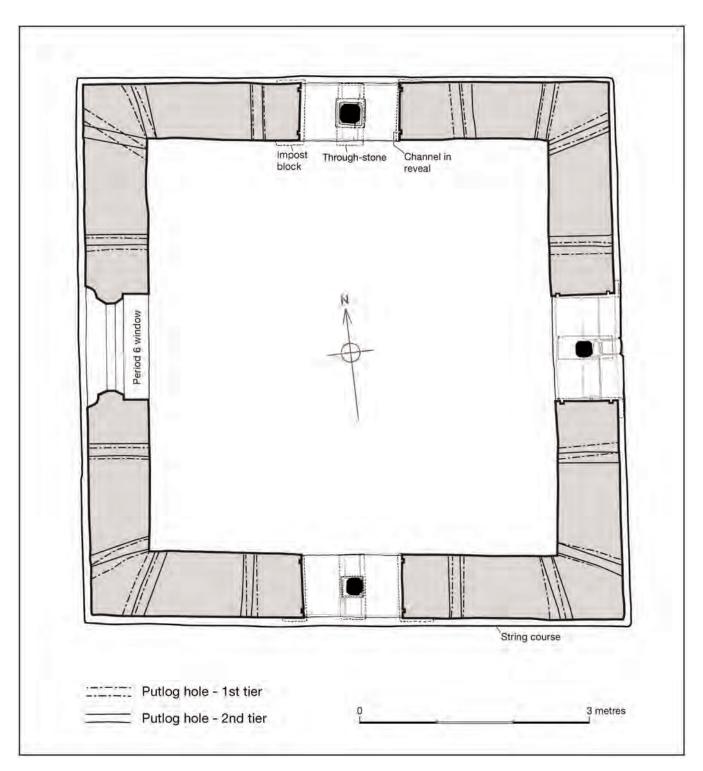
Tower: Stage 3. Plan of the Period 3 belfry at sill level, showing the locations and angles of the first and second tiers of putlog holes. Also indicated (by broken lines) are the imposts and through-stones of the three surviving original belfry openings. Drawing: Stephen Coll and Warwick Rodwell
